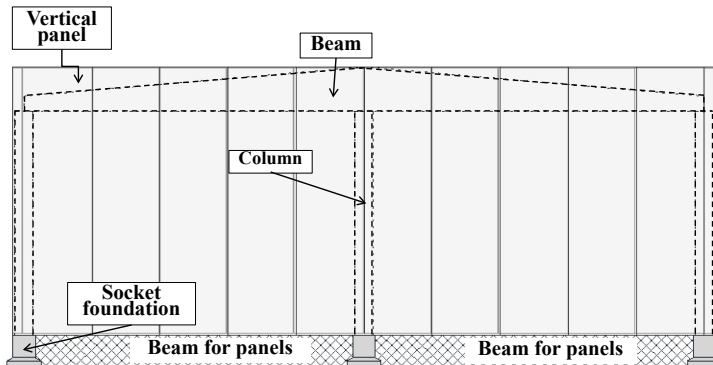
Typical vertical concrete panels arrangement in a precast one-story building
